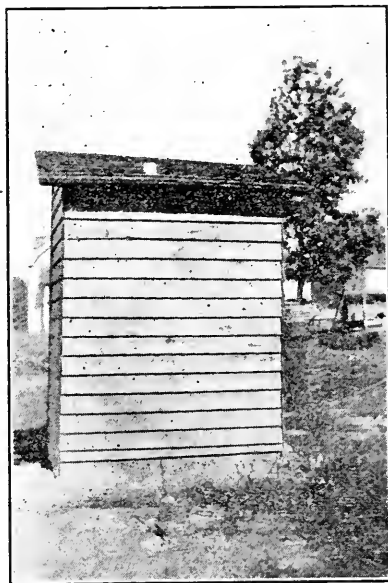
The same building as shown in Fig. 7, after reconstruction, placed over a North Carolina septic privy.
